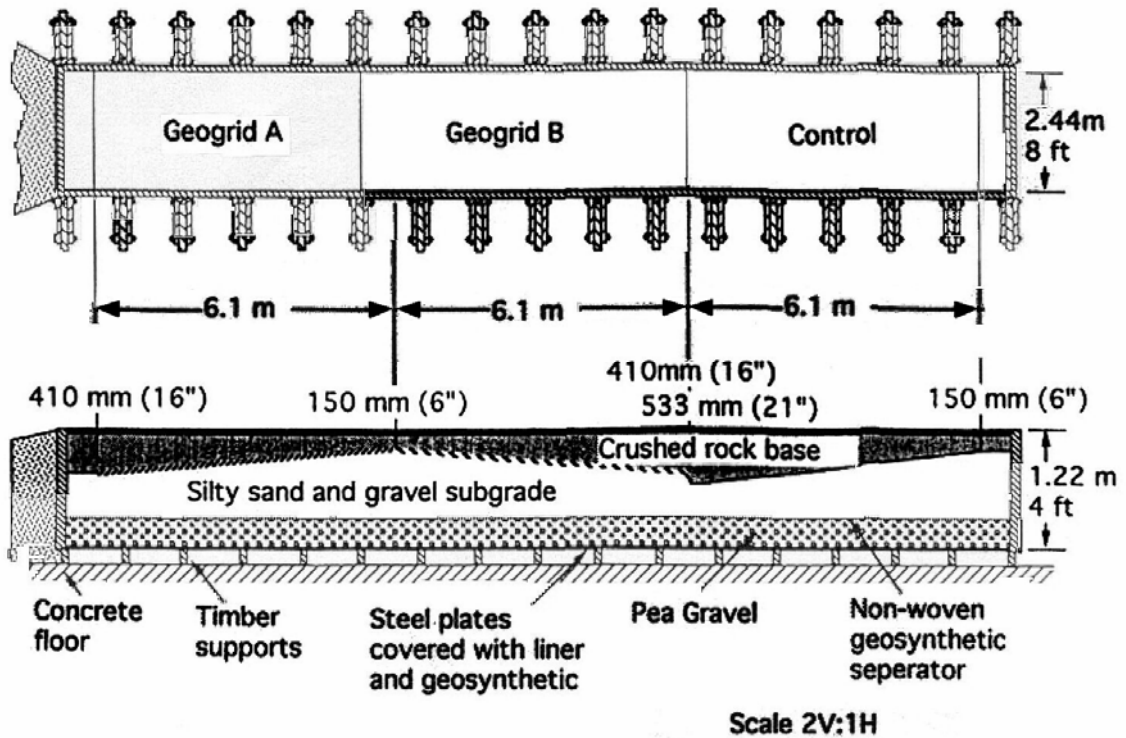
Cross section and plan view of University of AK Fairbanks test facility (Kinney, et al., 1998).
